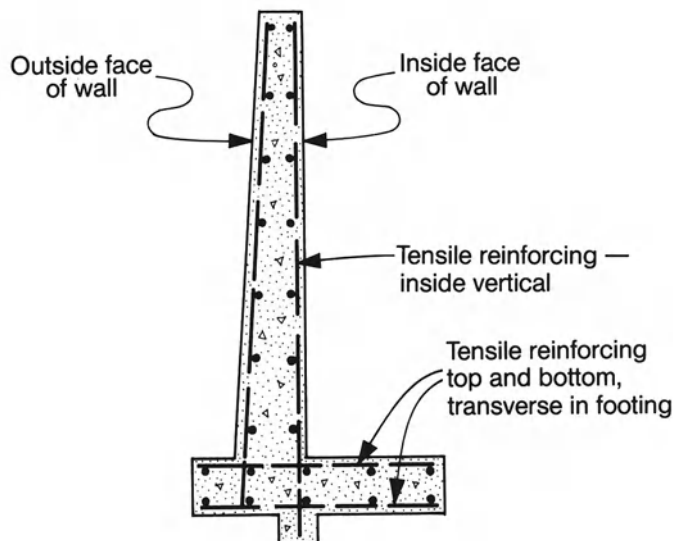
Typical reinforcing for a cantilever retaining wall.
